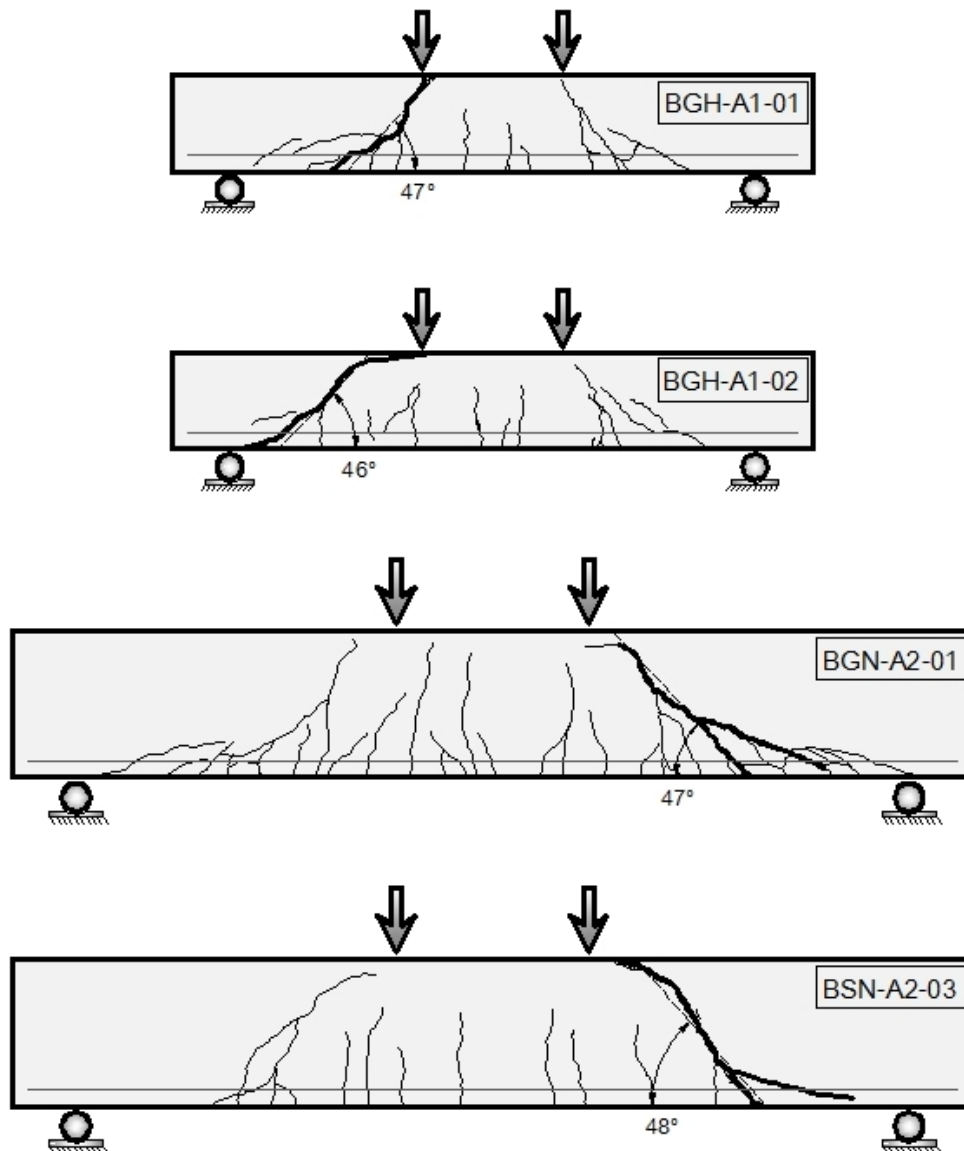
Crack patterns for normal strength concrete beams with different depths
